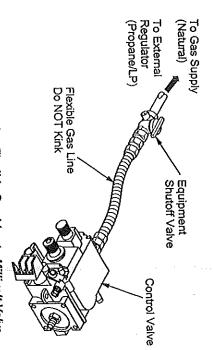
Connecting Flexible Gas Line to Millivolt Valve
